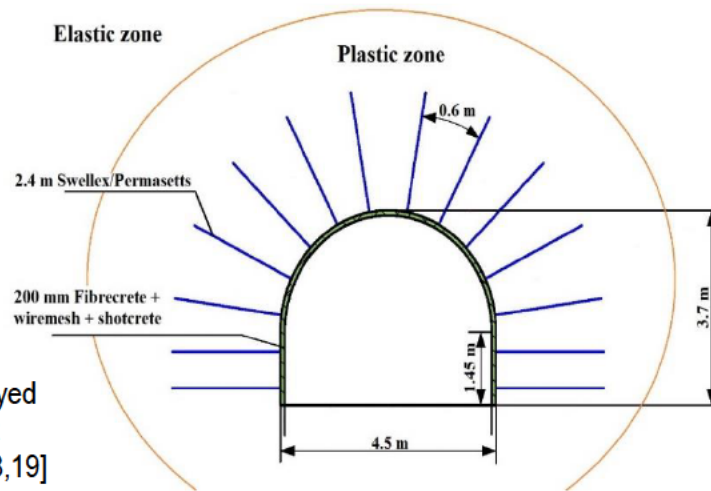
Current employed tunnel support structure at Nchanga Underground [18,19]
